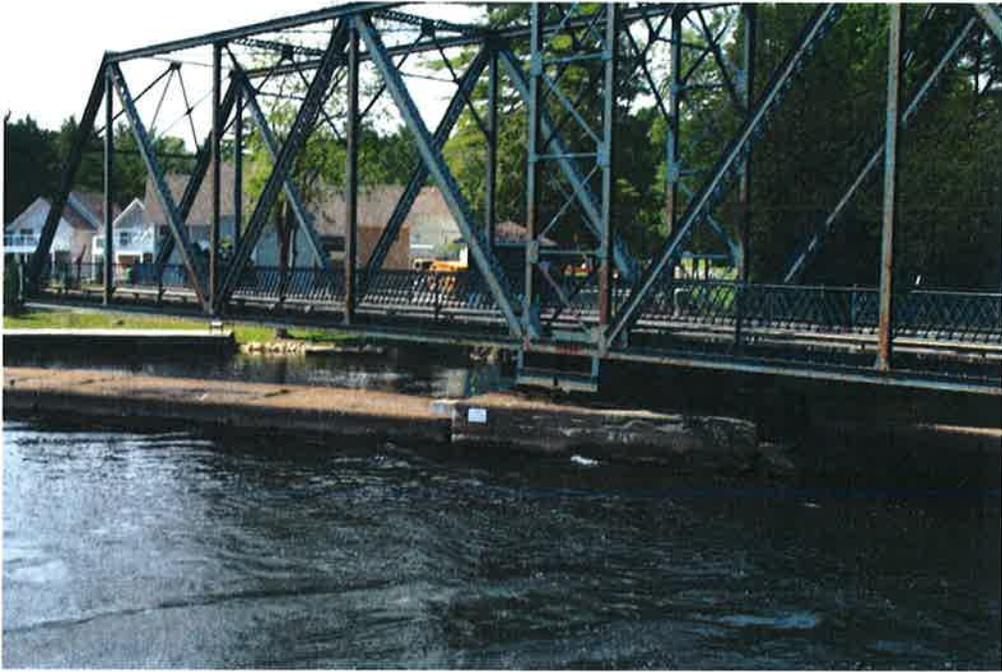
View of swing bridge in process of pivoting on centre pier.
